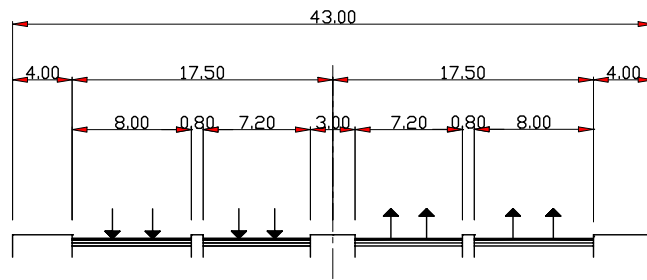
Typical Cross Section on Av. Almirante Barroso
